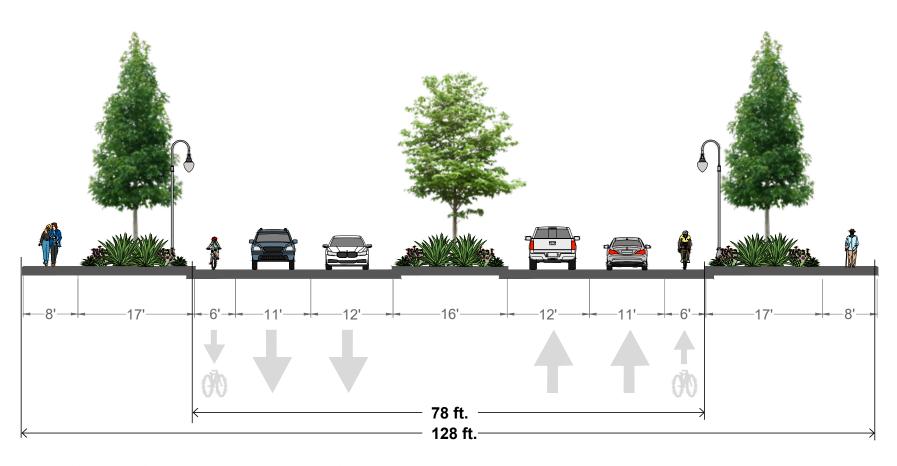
In the I-15 Commercial Area, the roadway lane configurations and widths are adjusted slightly to accommodate the bike lanes. Landscape and street lamps will be added.
